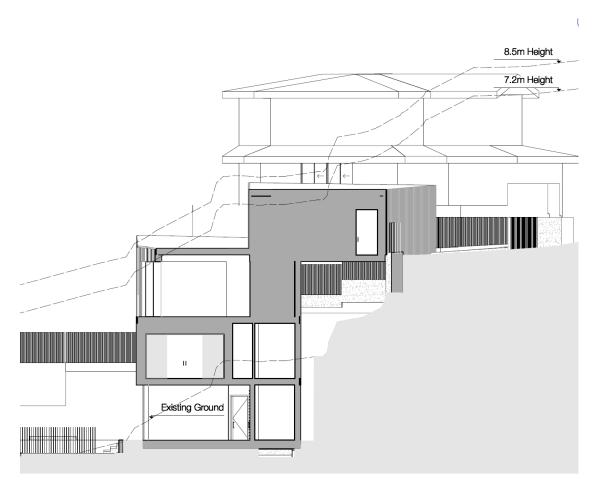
excerpt of plan section showing the 7.2m wall height and 8.5m height of building profiles
